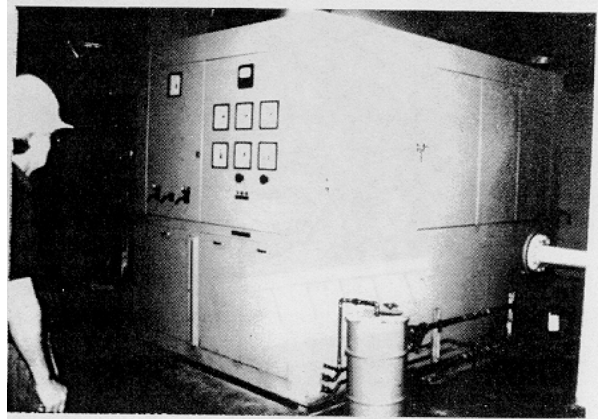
An unanchored heavy item of equipment can cause a pipe failure. An unanchored pump and sump used to operate the wicket gates can cause a pipe or pipe flange failure. Loss of pressure would deactivate the hydraulic wicket gate system
